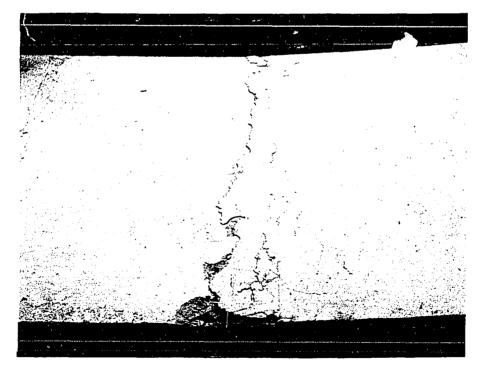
Flexure-crushing failure of beam constructed with steel deck G
